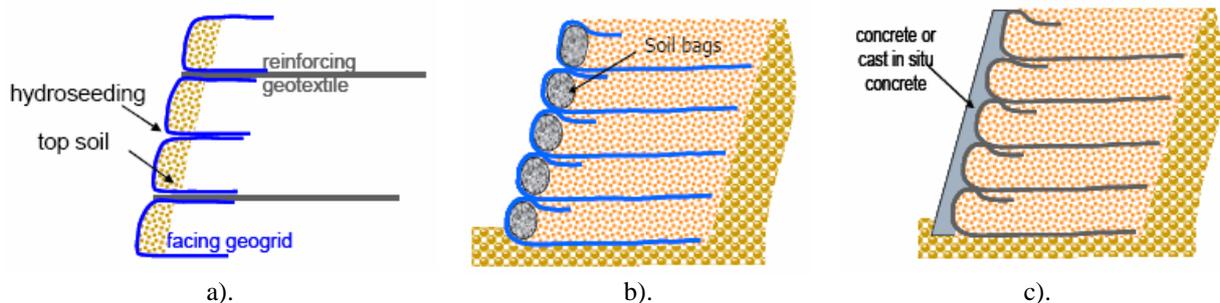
The design method recommended for retaining walls reinforced with geo-textile
